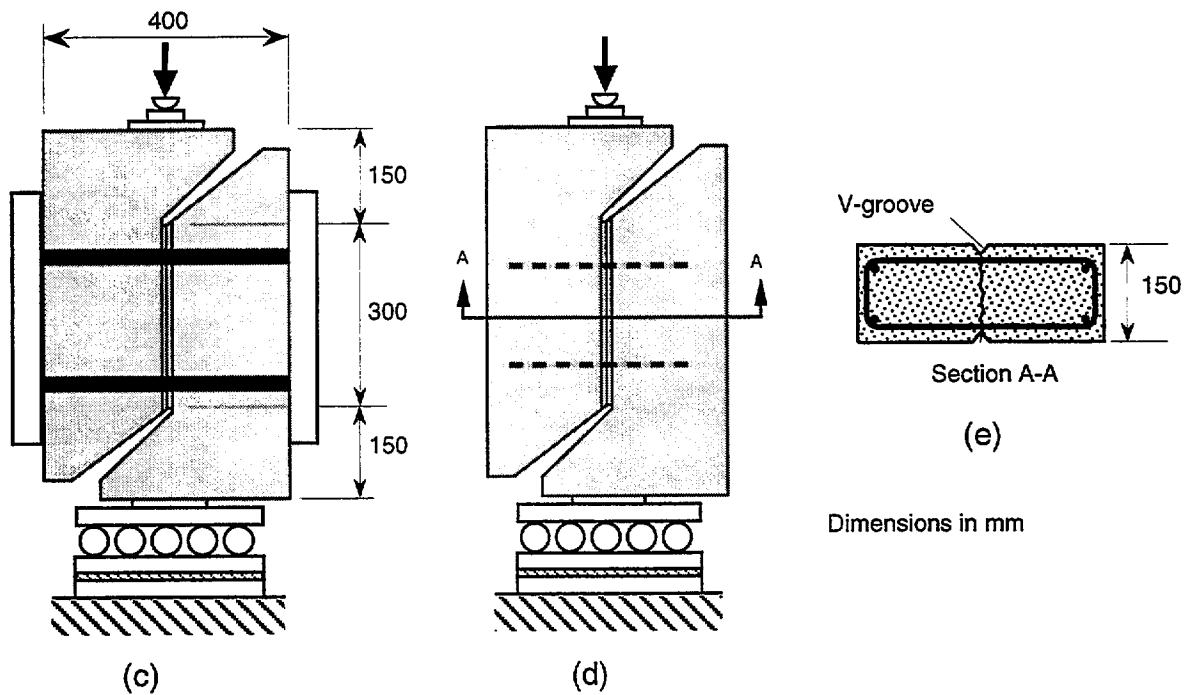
Push-off specimen with (c) external reinforcement and (d) internal reinforcement; (e) cross-section of internally reinforced specimen (Walraven 1995)
